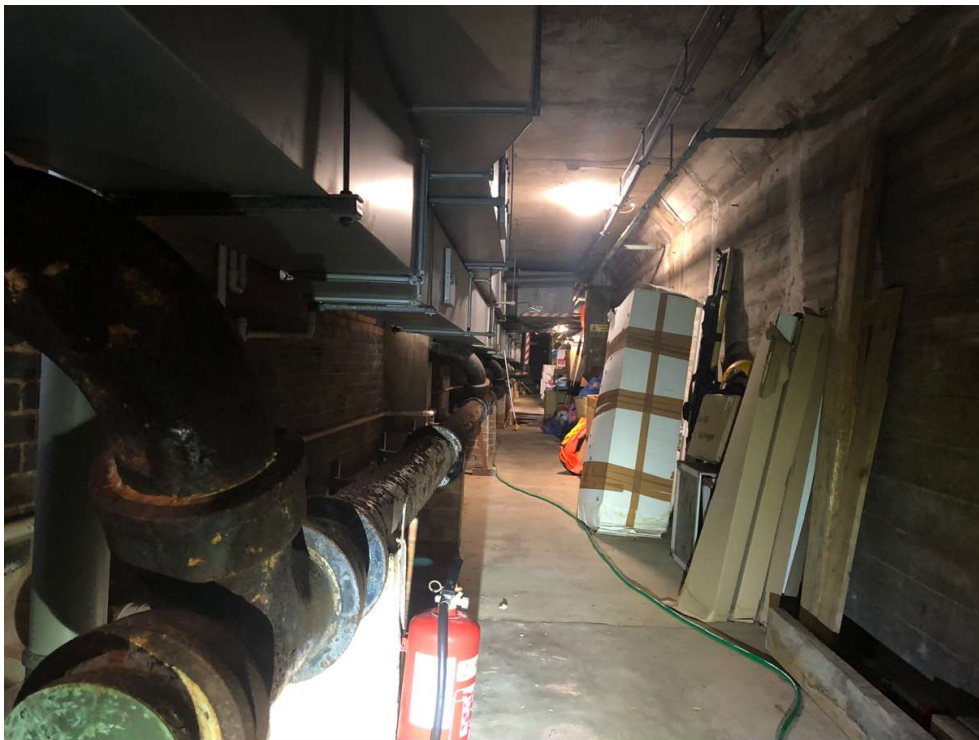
Southwest (repaired) columns on the left with a drainage pipe cast into each one. Reinforced concrete swimming pool tank is on the right of the photo.
